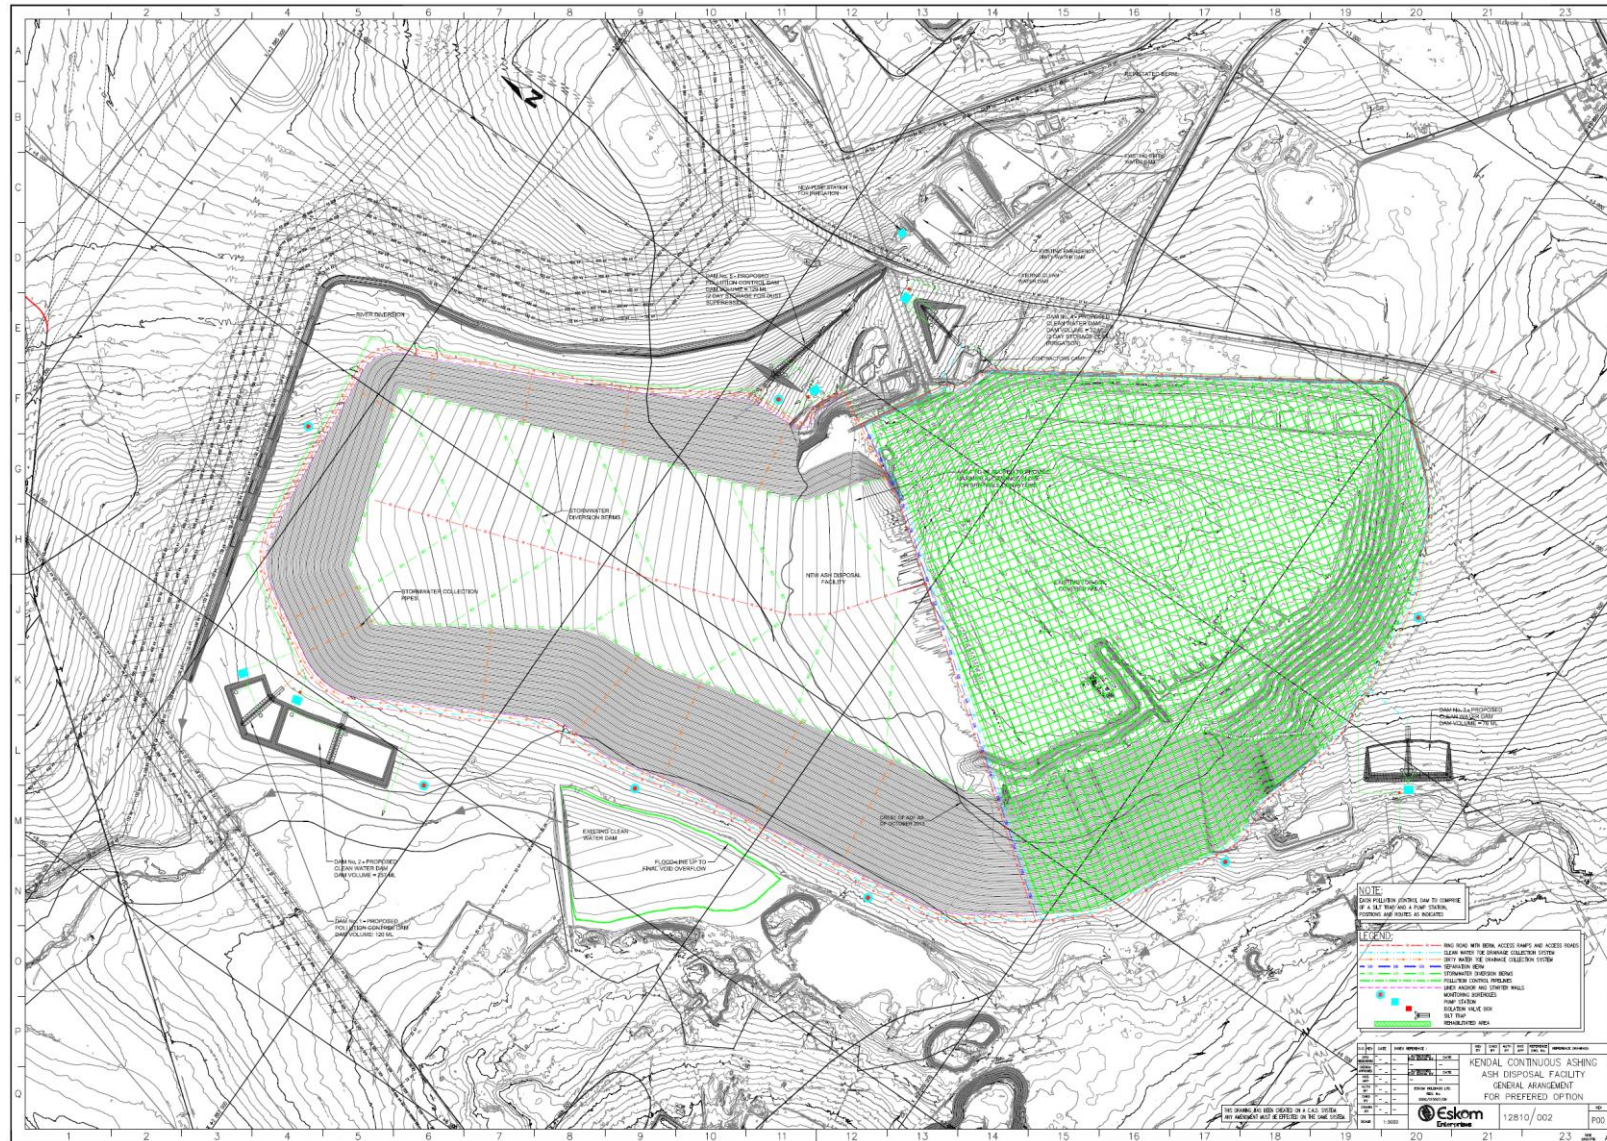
Proposed Development Plan - Continuous Ashing Site
